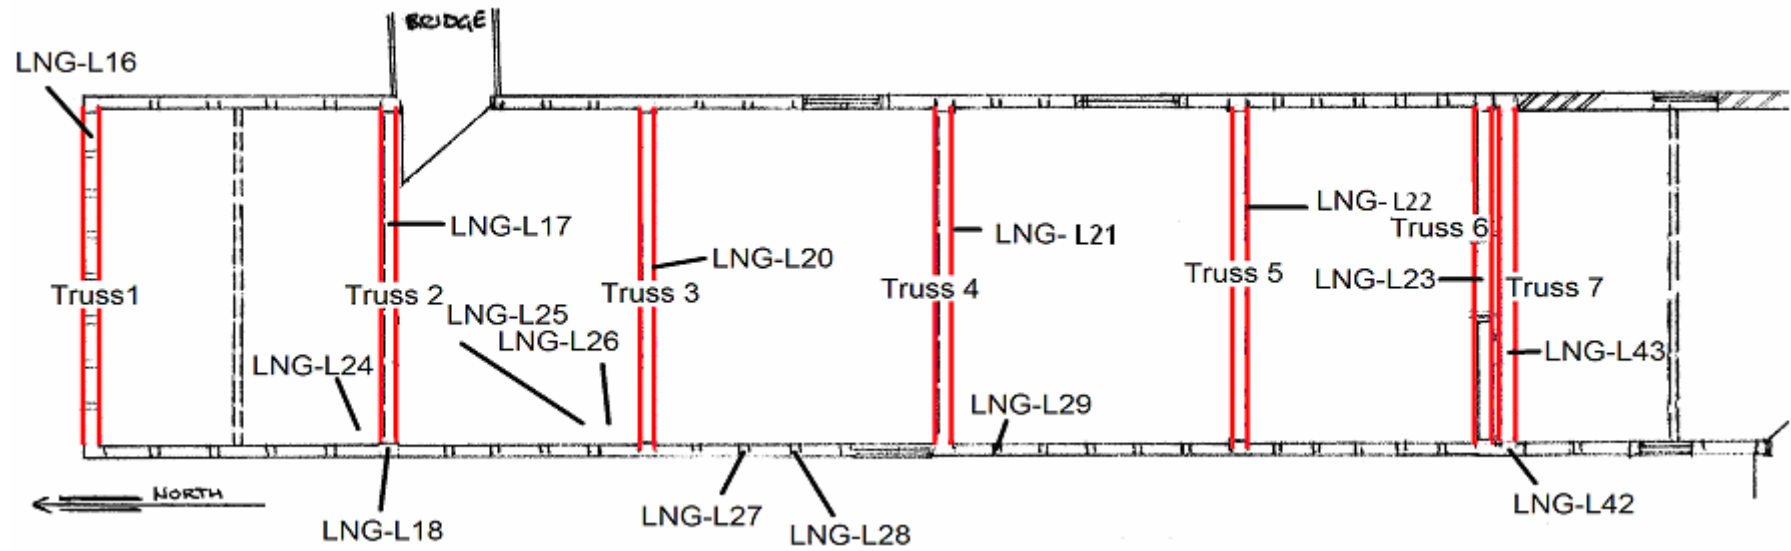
First-floor plan of the former stable block, showing truss numbering and the location of samples LNG-16–18, LNG-L20–9 and LNG-L42–3 (Wilson MacGarry Architects)
